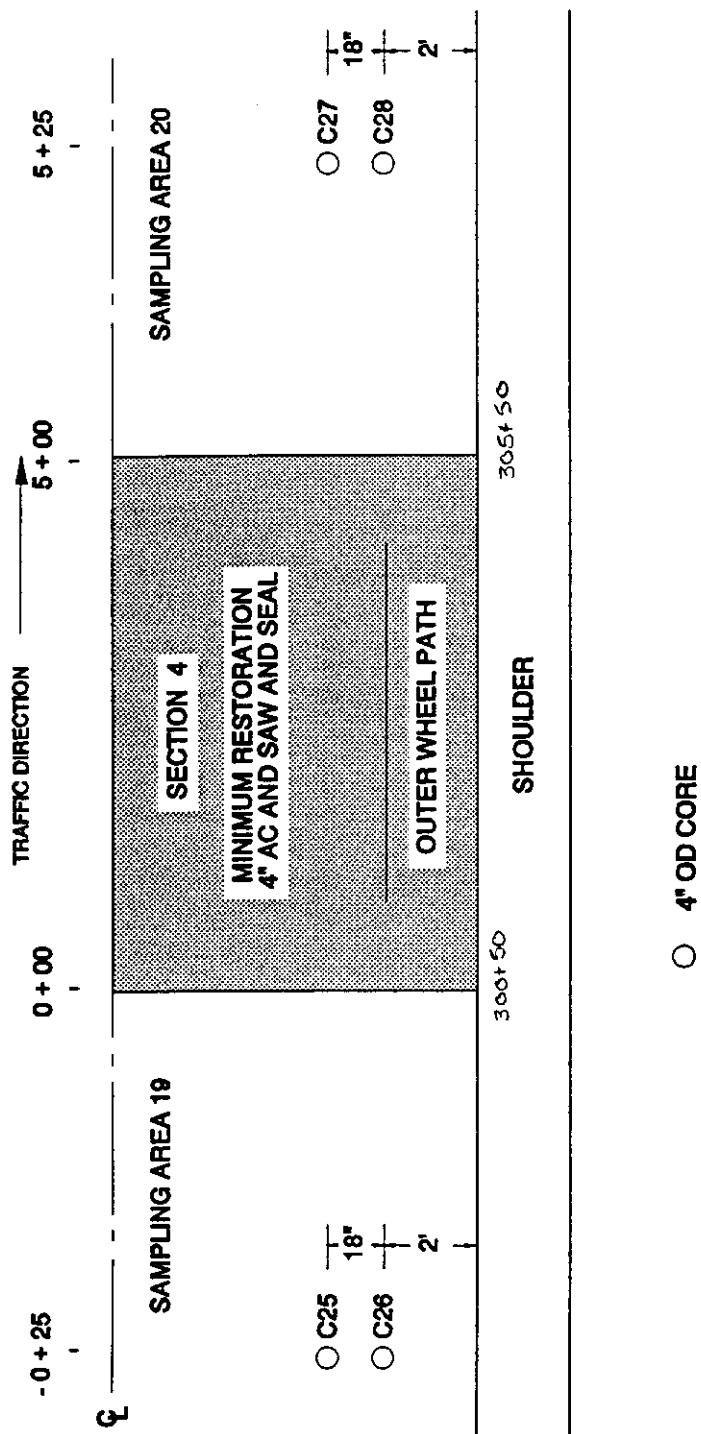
Example of "Post-Construction" Sampling Plan for Test Section 4
